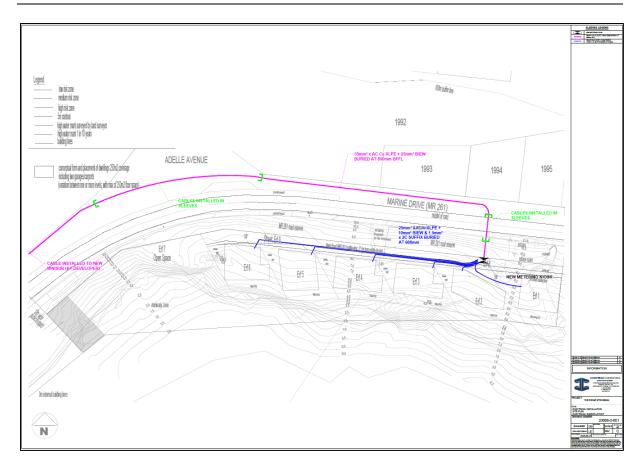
Electrical Sleeve Layout Plan – See Appendix G10
